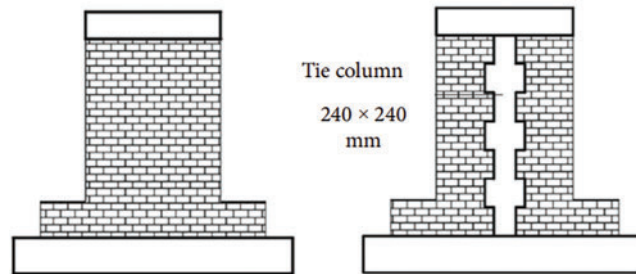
Typical configurations of unreinforced masonry walls [57]. Adapted with permission from Ref. [57]. Copyright ©2017, Elsevier B.V.
